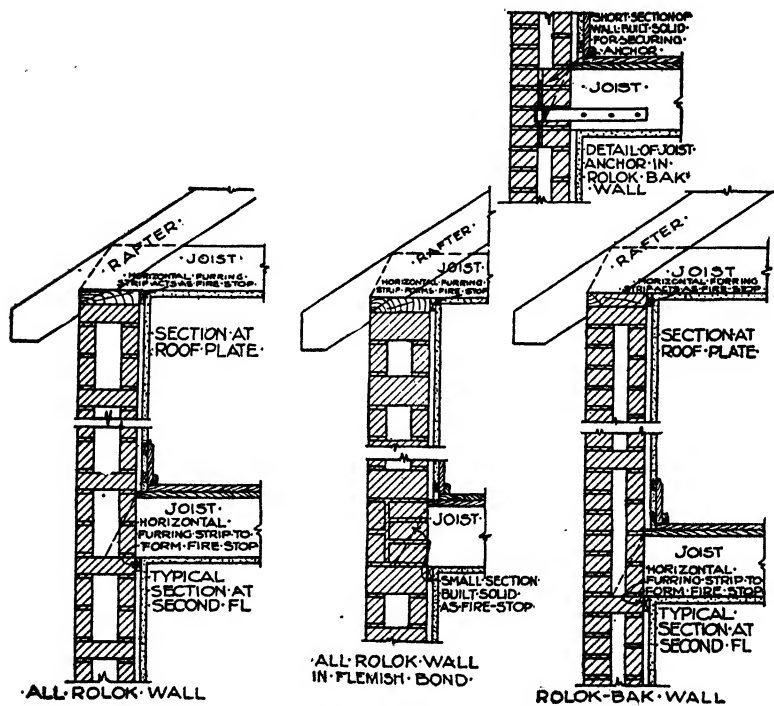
Details of hollow walls at floor and roof levels, showing typical joist and roof supports.
